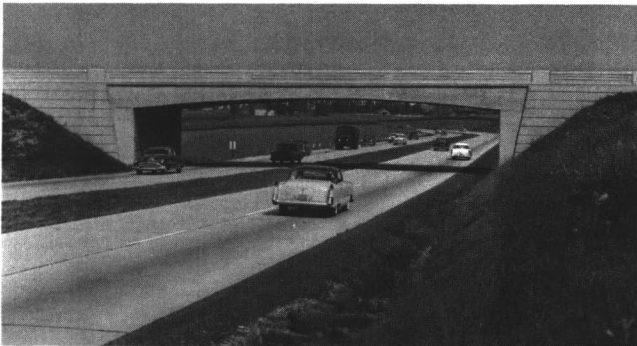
The shallow superstructure of the solid-slab rigid frame minimizes earthwork in bridge approaches. Side slopes at this structure in Tucson, Ariz., have been given a protective surfacing of pneumatically applied mortar. Design: Bridge Division, Arizona State Highway Department. Construction: San Xavier Rock & Sand Co., Tucson, Ariz.
